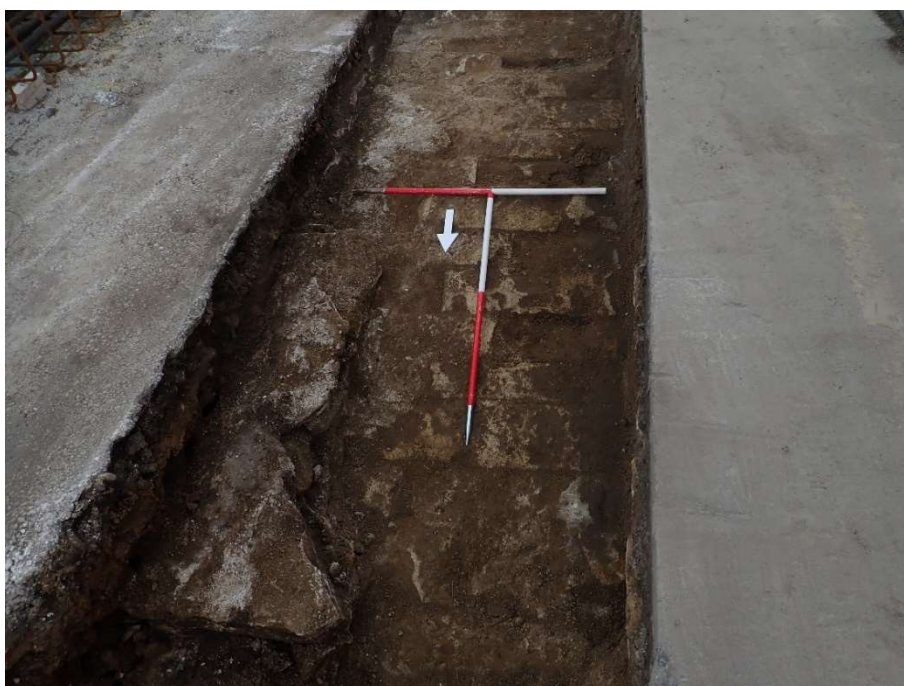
Deck fill excavation, Central section, Overview of bridge 17th C arches 100004 & possible spandrel wall 100008, facing south.
